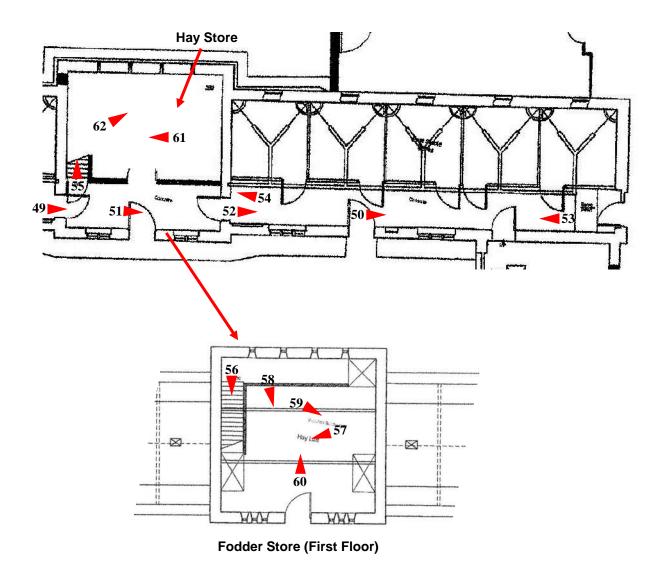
The North Stalls (east block); Hay Store (ground floor) and Fodder Store (first floor).
